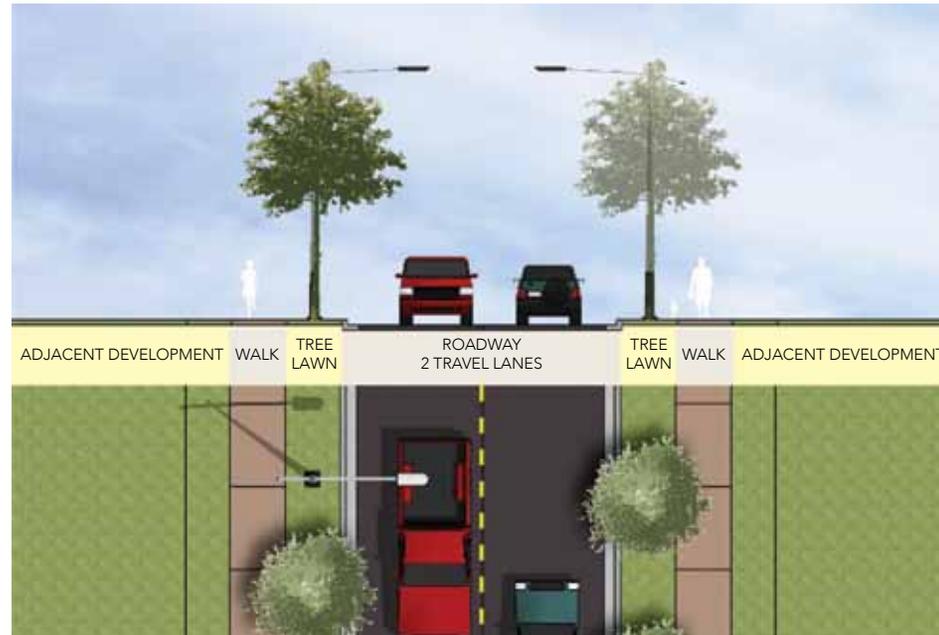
Proposed urban roadways- Cross section and plan view of proposed roadway character.
